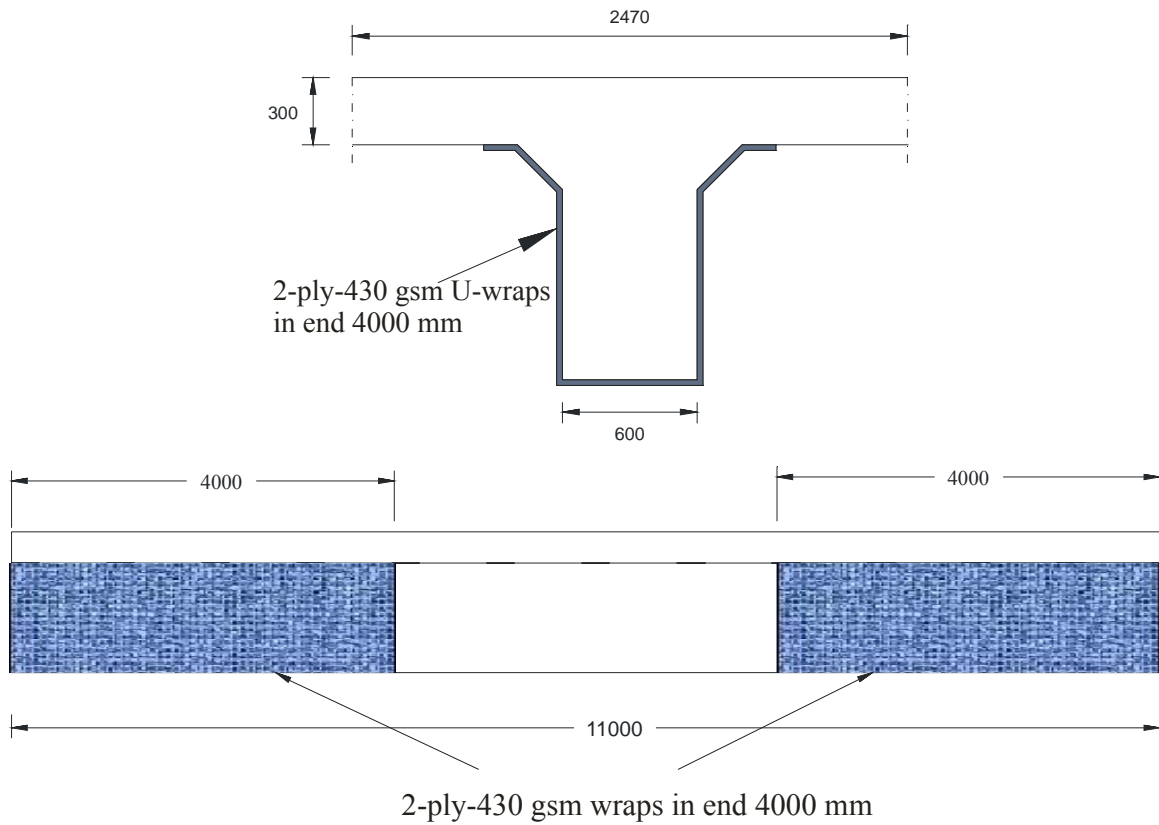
Flexural strengthening of Superstructure and shear strengthening of slab
